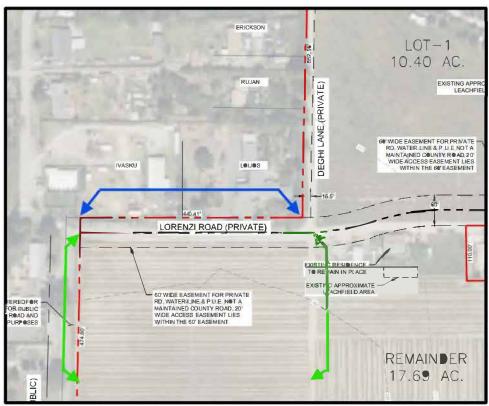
The blue lines show the width of adjacent properties that prevent the flag bt strip from meeting the 300-foot depth requirement. The green lines show where the width of the strip could be widened to prevent Lot 1 from being considered a flag lot.
